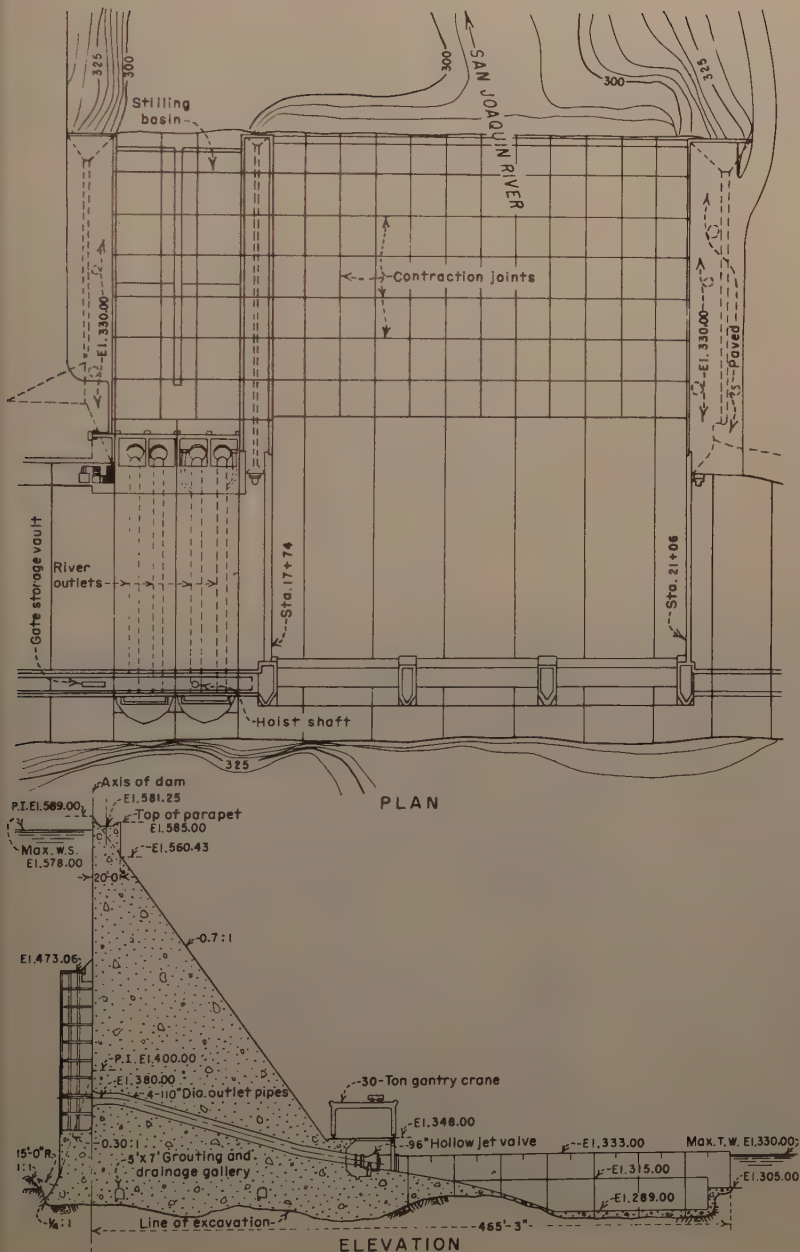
PLAN AND ELEVATION OF RIVER OUTLETS
